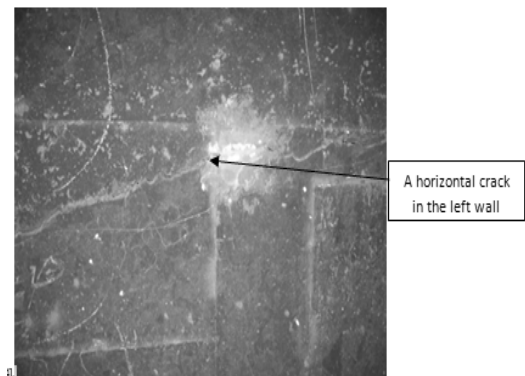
Gypsum label was removed in the cracking wall of Alsfkon tunnel
